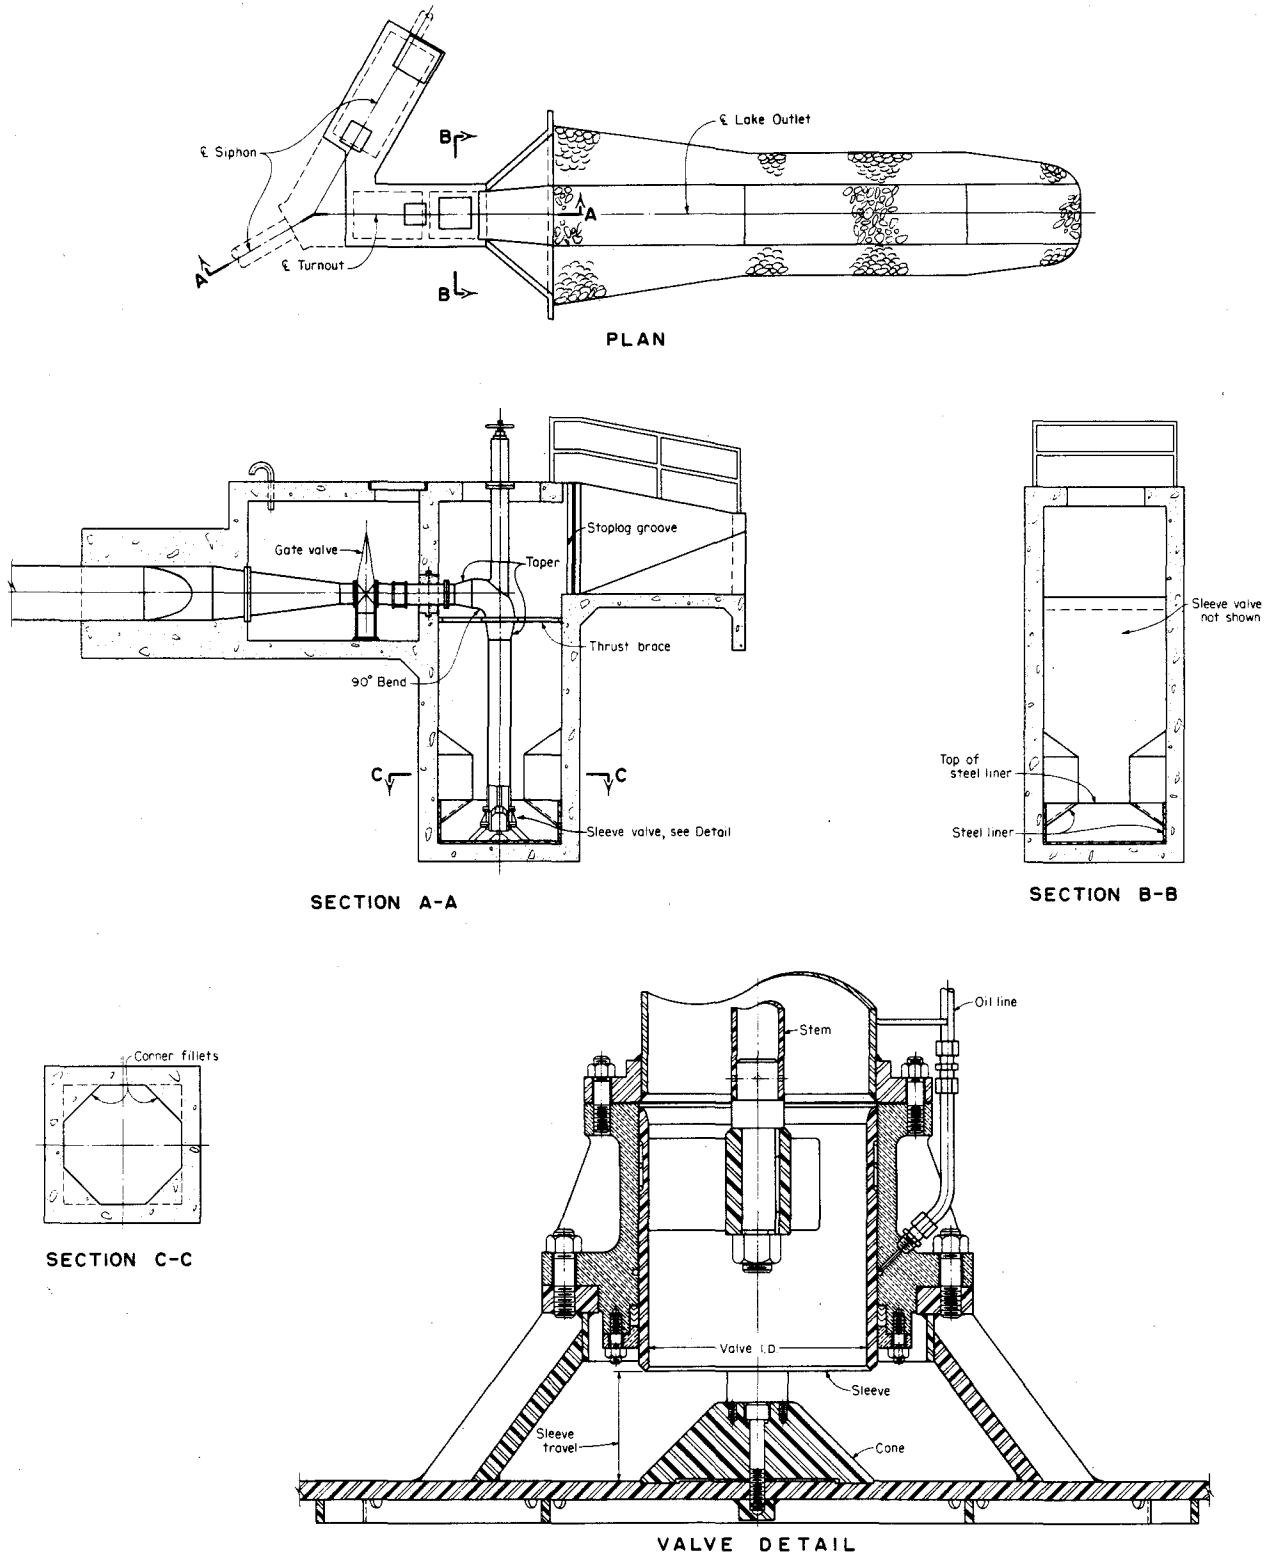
Typical sleeve valve installation for pipe turnout. 103-D-1351.
